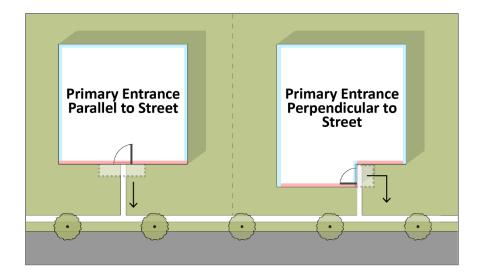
B: LIMIT BLANK WALLS
